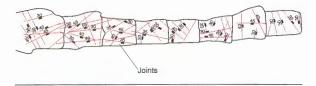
Generic plan view of a drive showing joint sets mapped with oriented traces on the plan
